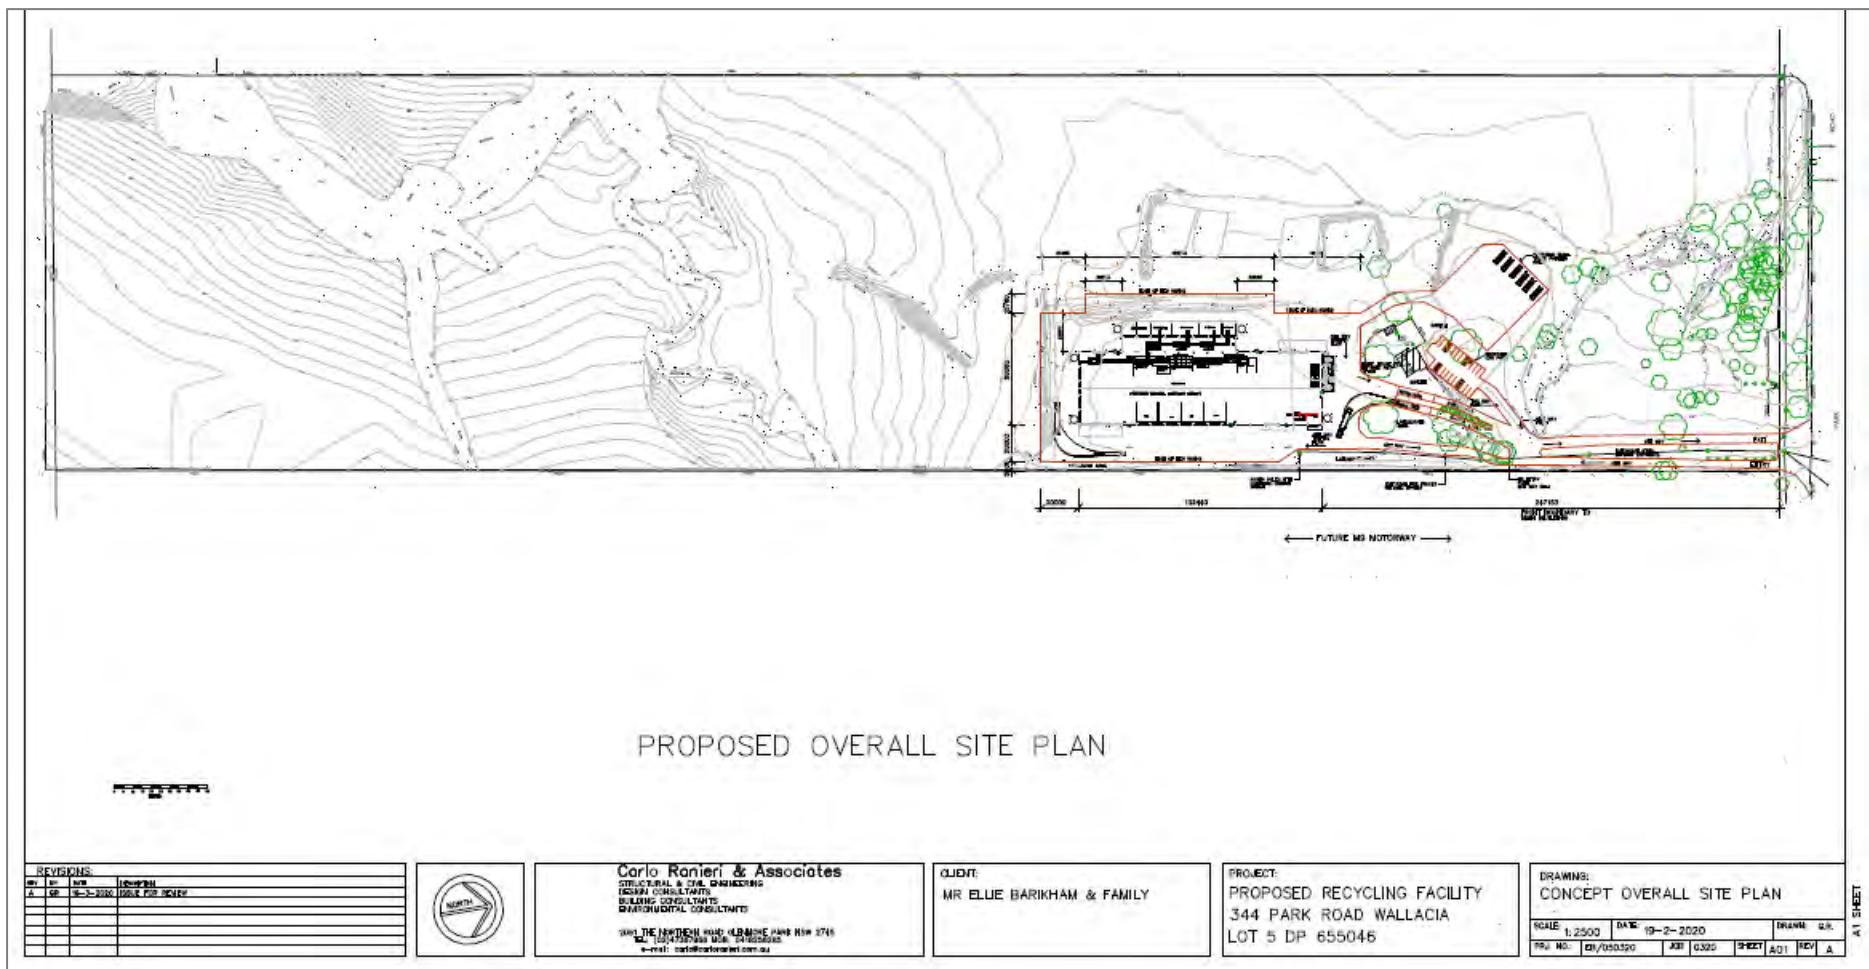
Design Plans for the Proposed Development (Carlo Ranieri and Associates 2020).
